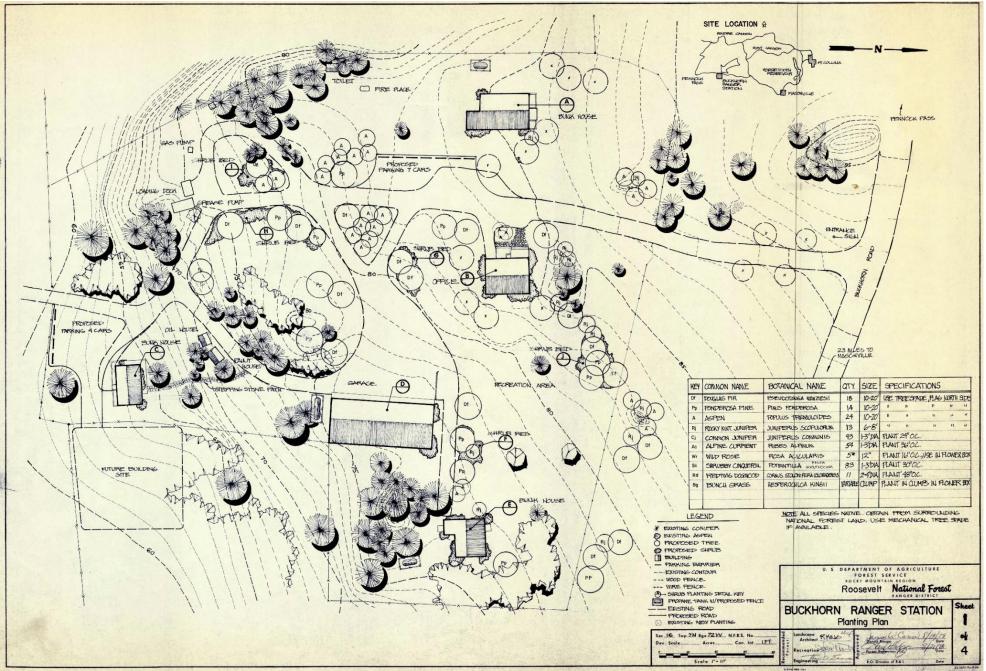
United States Forest Service (1978) Development Plan of the existing site and plans for additional plantings, ground features and parking areas. These plans did not come into fruition.
